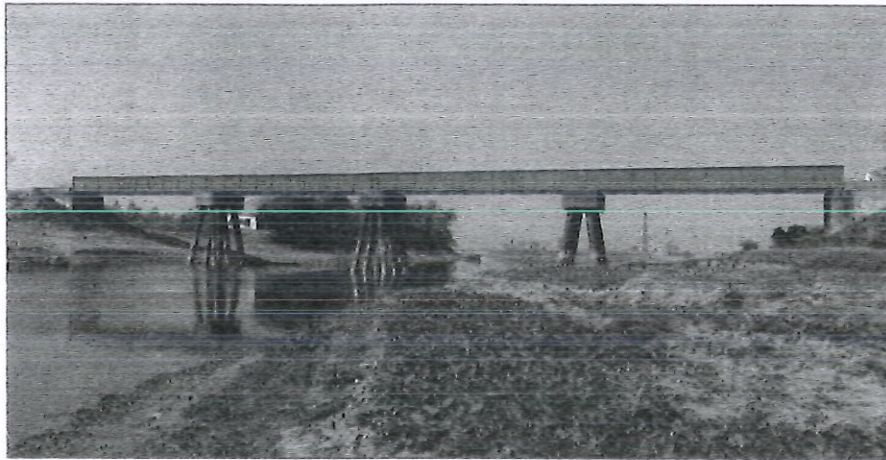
Bridge No. 14 Over River Turag Showing Stable Bank (view from Downstream)
